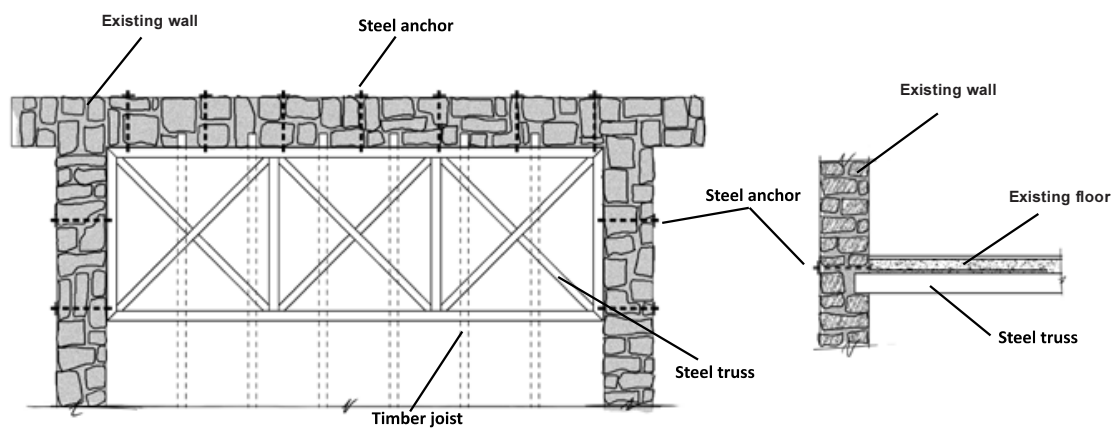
Retrofitting the floor and roof structures: a) diagonal brace
